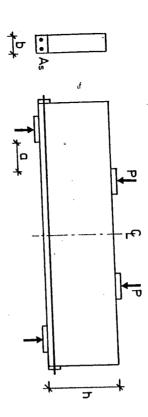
Rectangular reinforced concrete beam subjected to concentrated loads.
